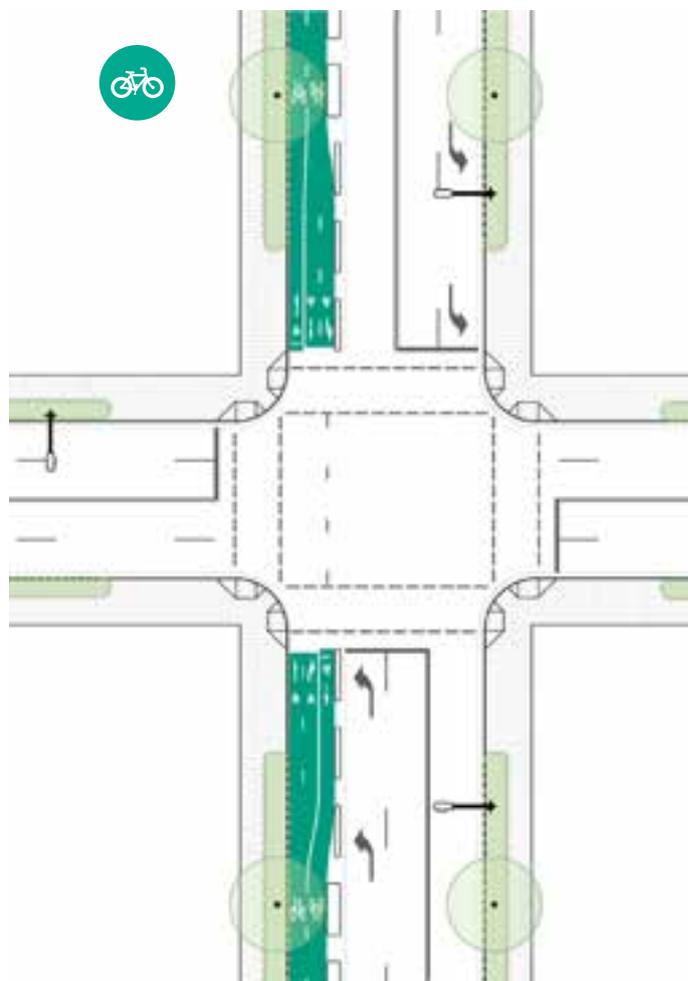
Bicycle path (two-way), signalised intersection - plan
